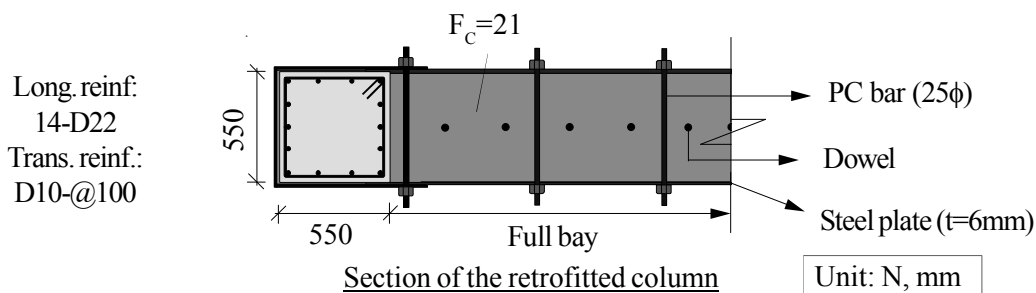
Column retrofitted with thick hybrid panel wall
